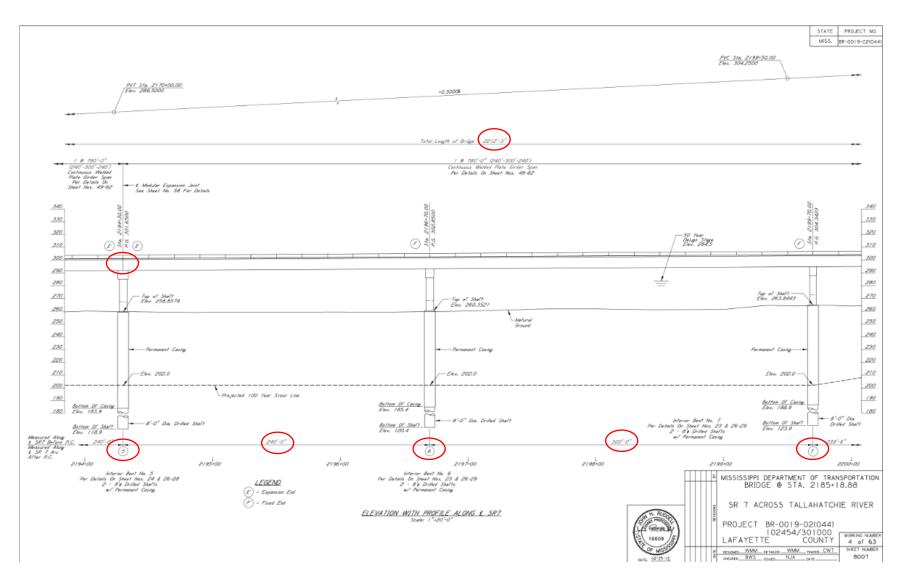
Beginning of 780 ft steel-girder supported over Piers 5, 6 and 7
